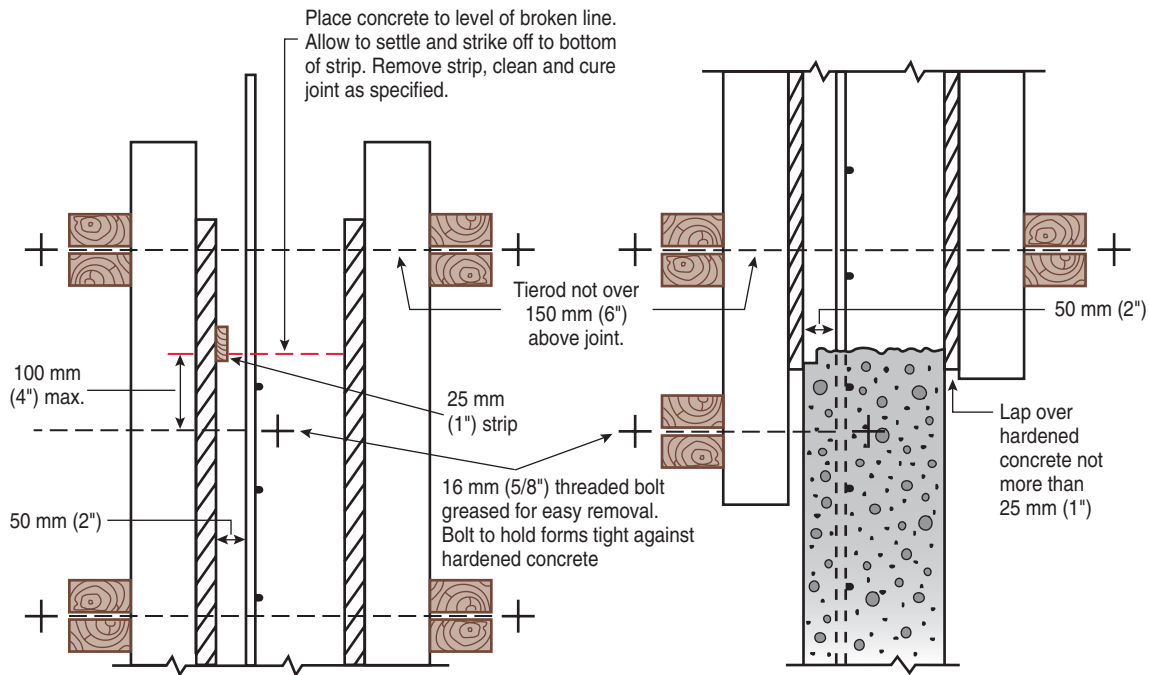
A straight, horizontal construction joint can be built using this detail.
